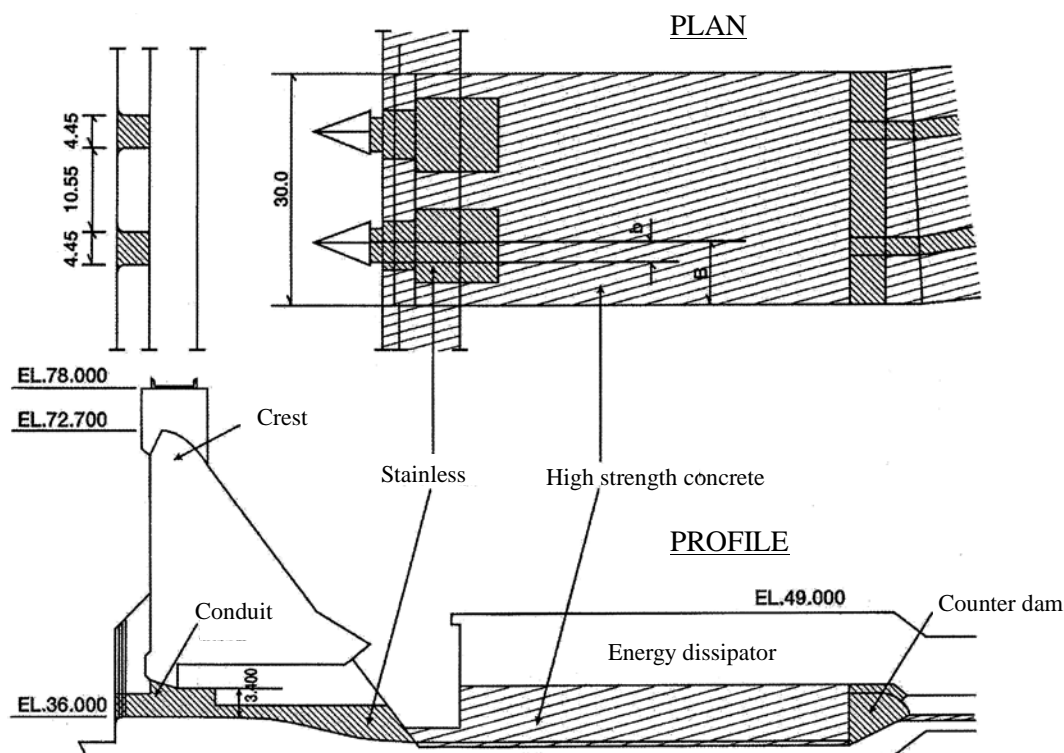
Example of Flushing Facility (Masudagawa Dam in Japan)
